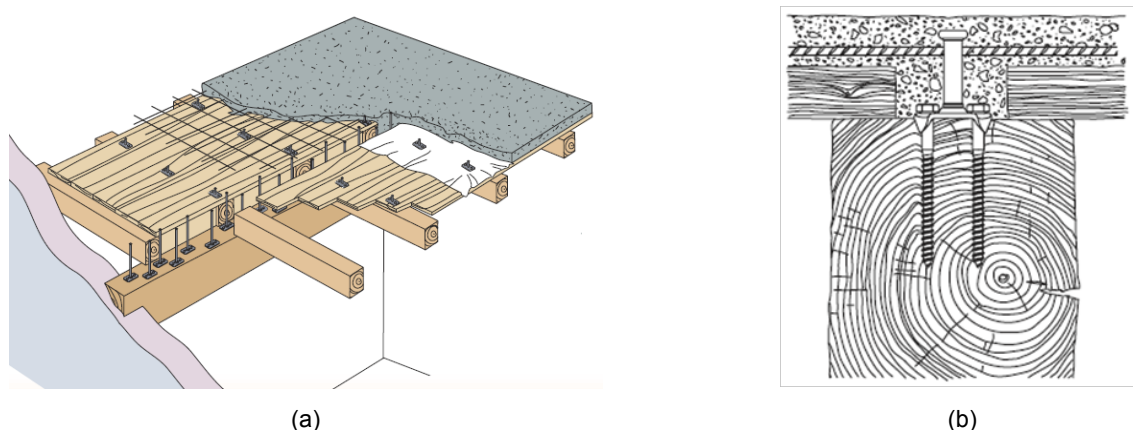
(a) Example of the reinforcement of a wooden floor with a cooperating reinforced-concrete slab, (www.tecnaria.com). (b) Basic connectors Tecnaria (www.tecnaria.com).
